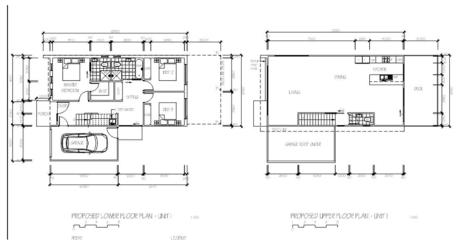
Unit 1 Floor layout (G Hills & Partners Architects, 2020)
